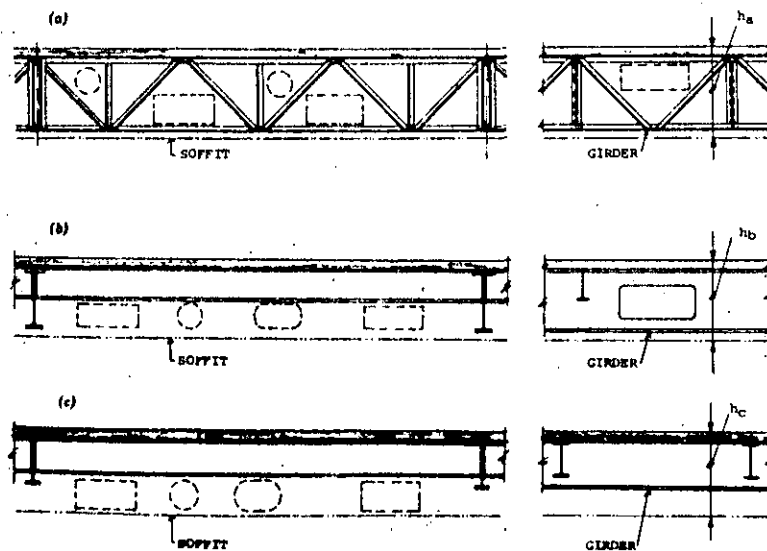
Ductwork, piping, and wiring in floor structures: (a) Latticed structures; (b) Plate girders with holes; (c) Ductwork, piping, and wiring suspended under floor structure
